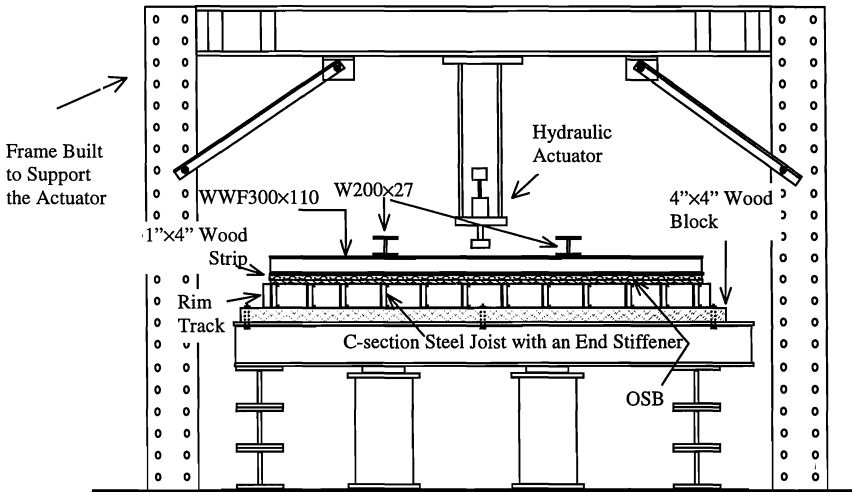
End details of floor set-up (fl-6.114-2-6\"/>
